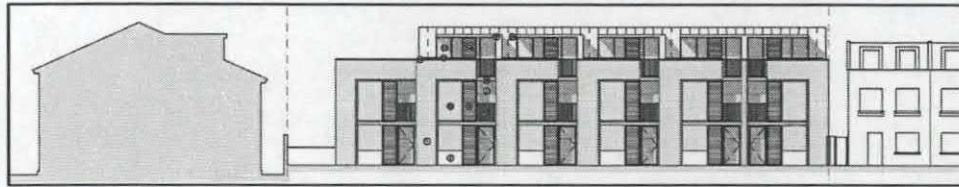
Front elevation: Townhouses (Private Communal garden Elevation)
